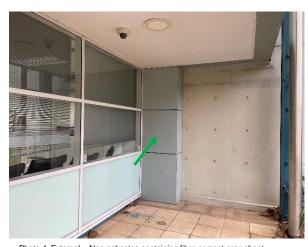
External – Non-asbestos containing fibre cement grey sheet cladding panel to the southeast interface of Research building and Ainsworth building
